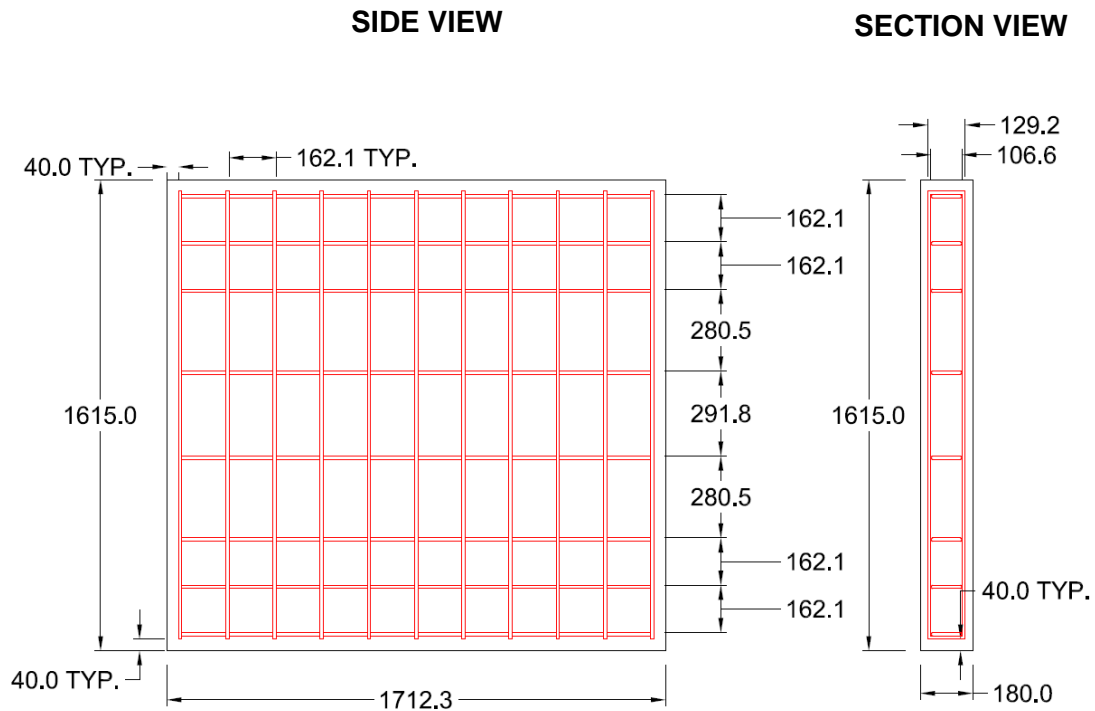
G1 Girder Web Design and Reinforcement Layout
